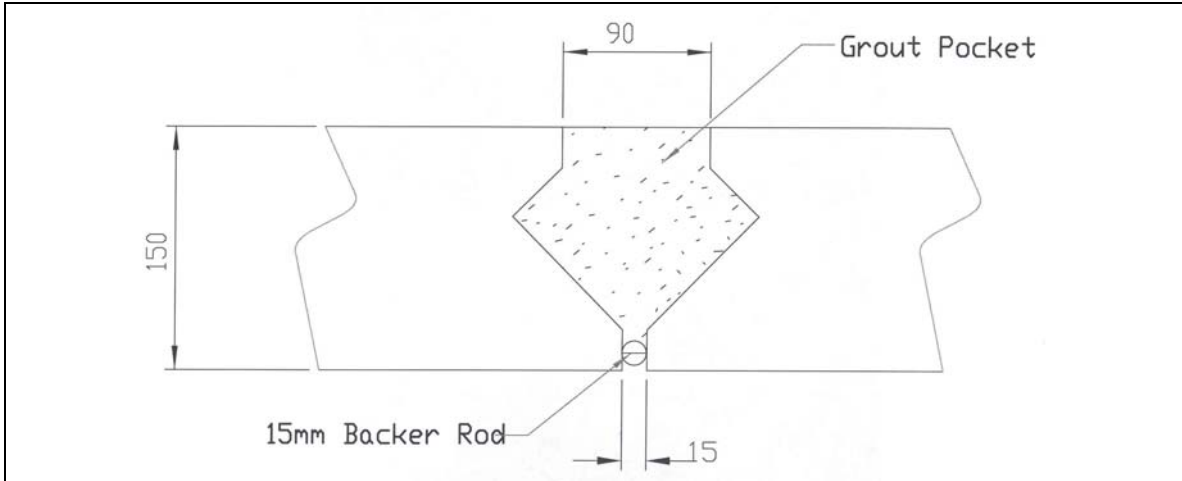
Typical transverse joint detail (NDOR, 2002)
